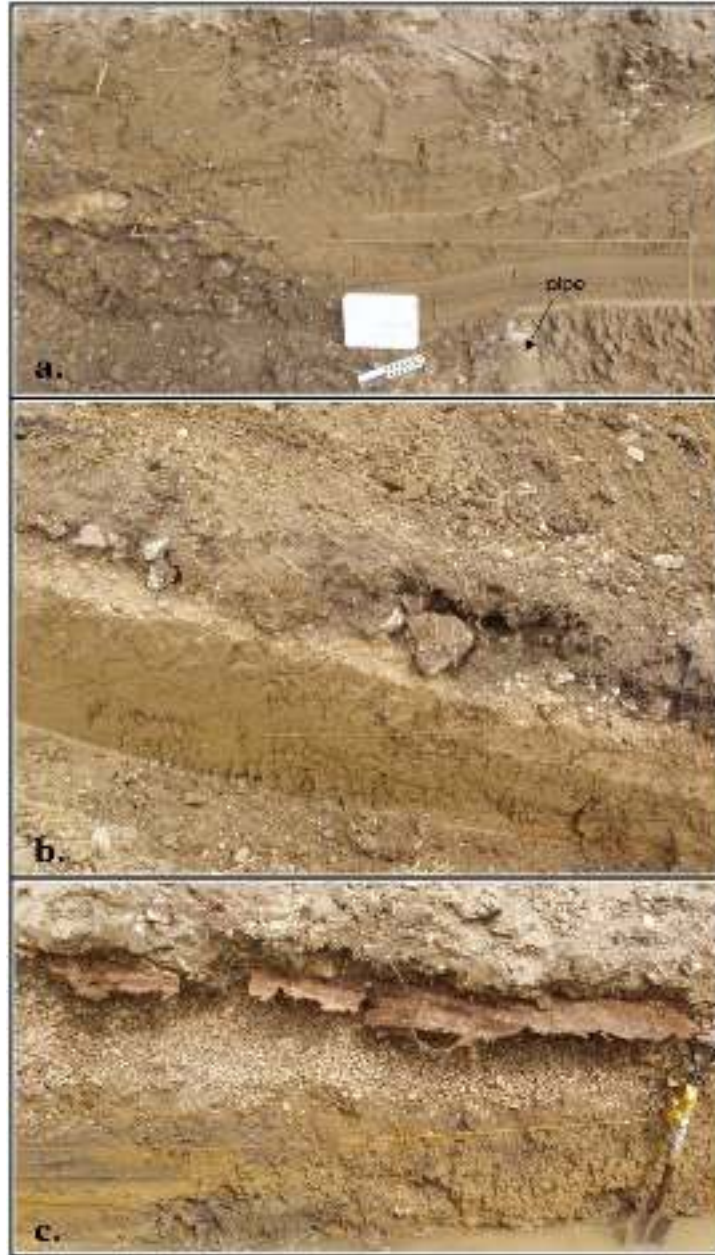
The north wall of Trench 2; a) west end of trench, under upper road; b) middle section with large rocks; c) trench under lower road
